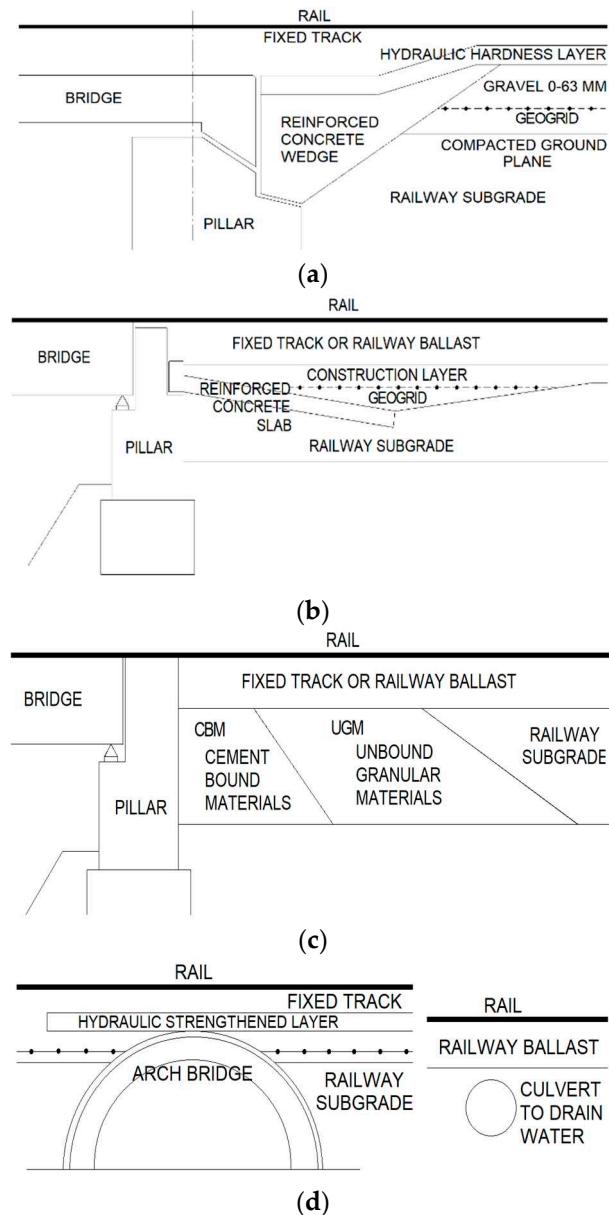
Structural parts and layers in transition zones: (a) Reinforced concrete wedge; (b) Reinforced concrete slab; (c) CBM and UGM material; (d) Arch bridge and culvert.
